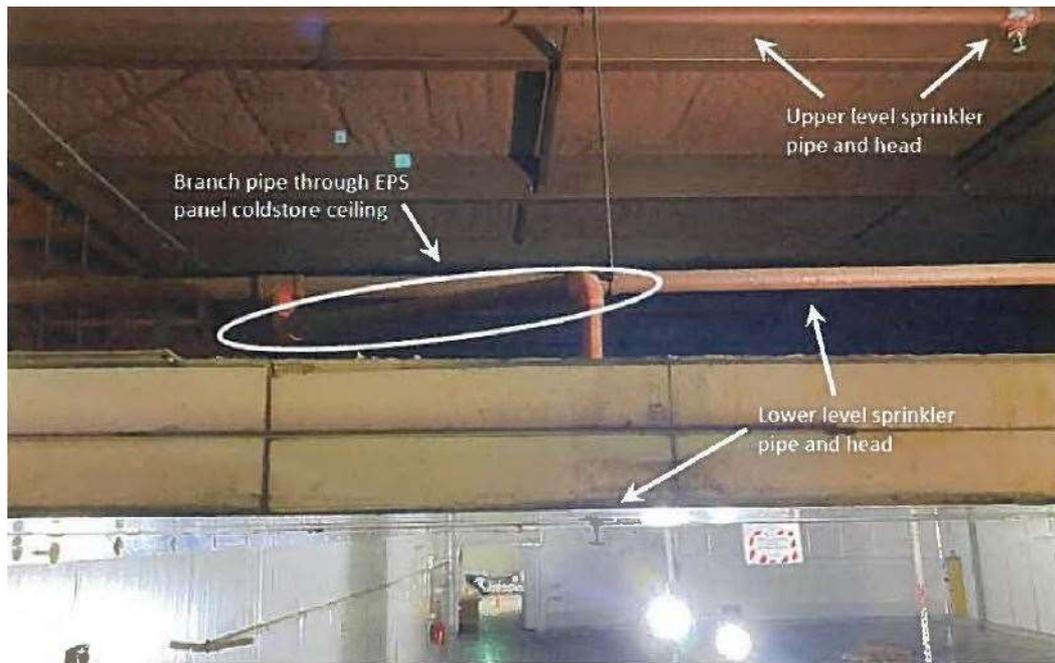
Cross-section view of a coolstore, showing details of the existing sprinkler system
